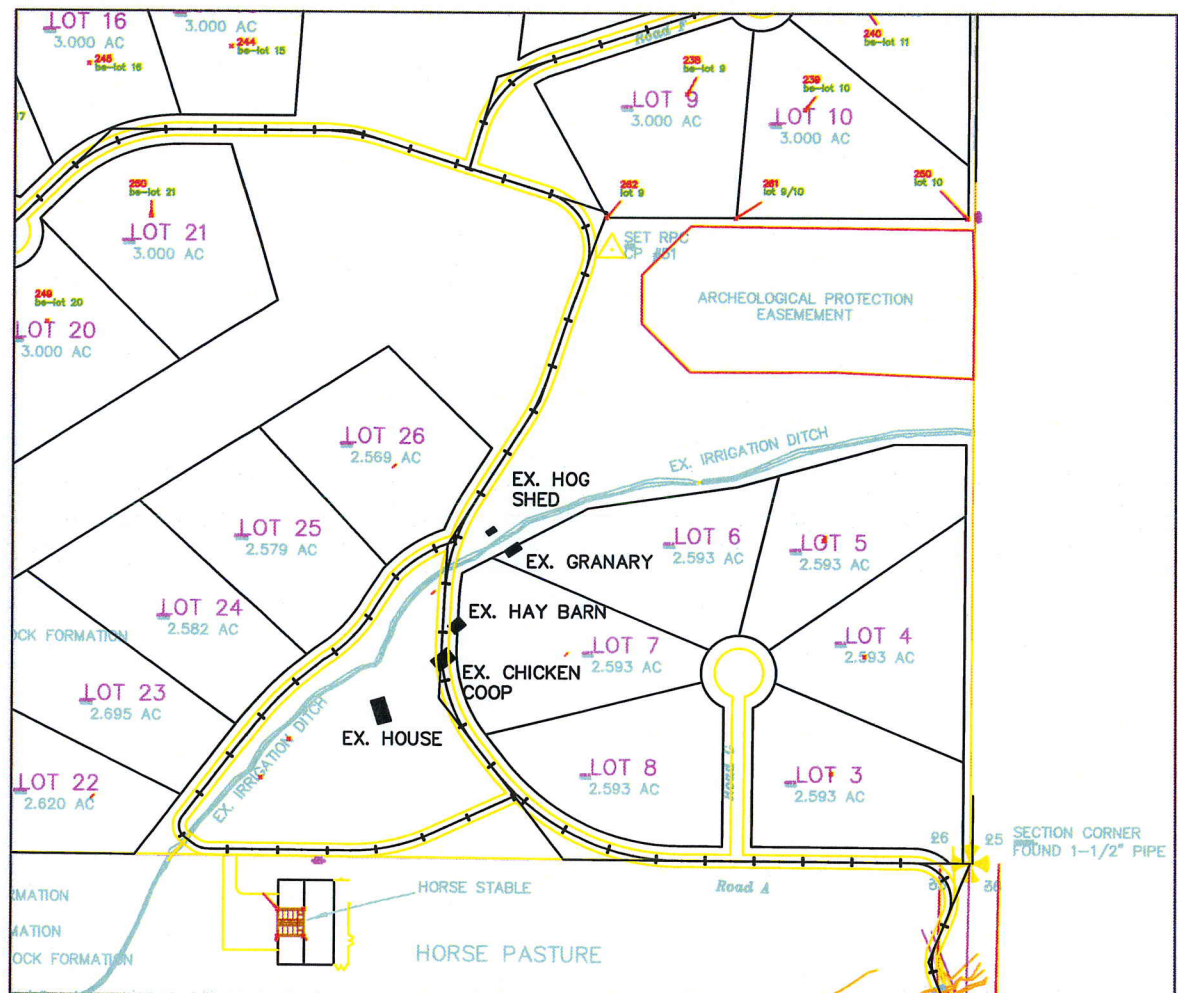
Plan view of existing structures scheduled for demolition within the proposed Stone Ridge Club Development.
